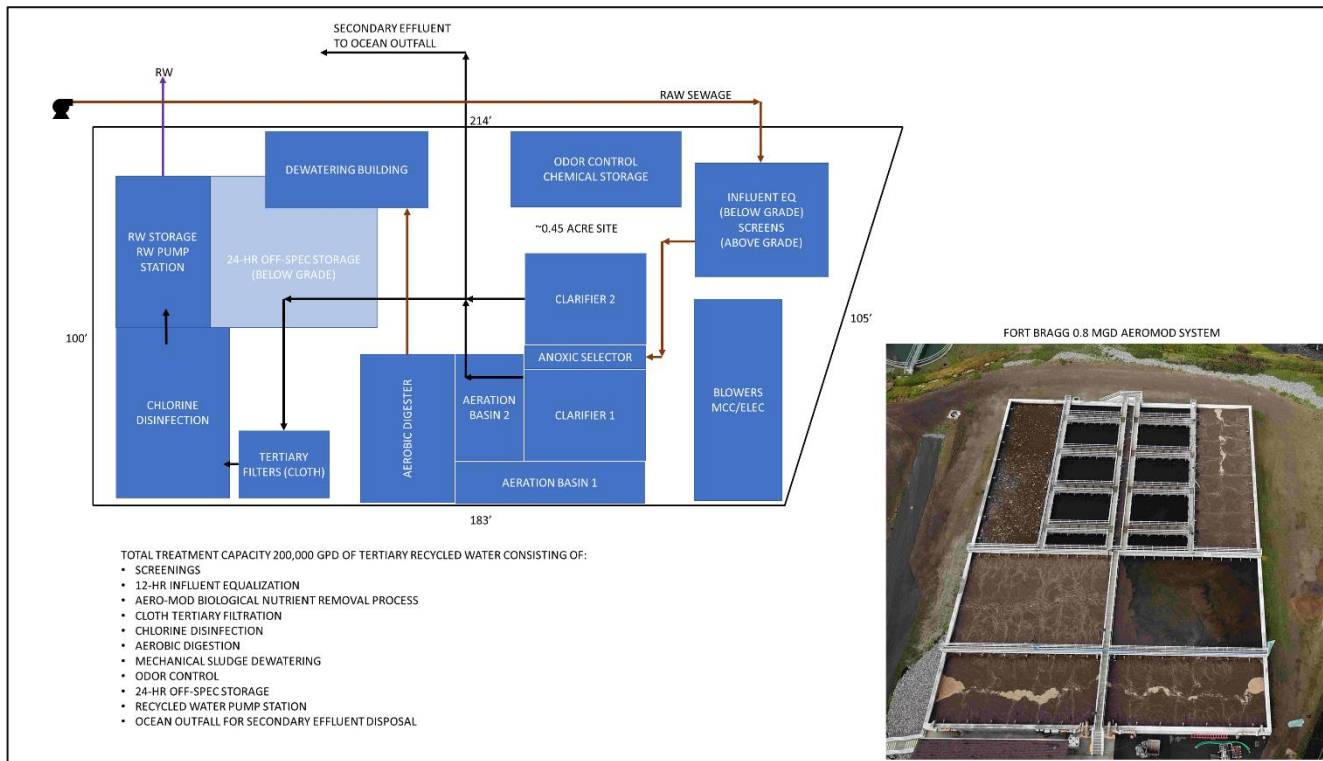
illustrates the components and potential layout of a plant using the activated sludge treatment process. For the purposes of this evaluation, we have assumed the AeroMod treatment plant configuration, as this equipment uses common wall modular construction to decrease land requirements. It is noted that this is a schematic representation of the potential plant layout, with the exact layout prepared during the design process.
